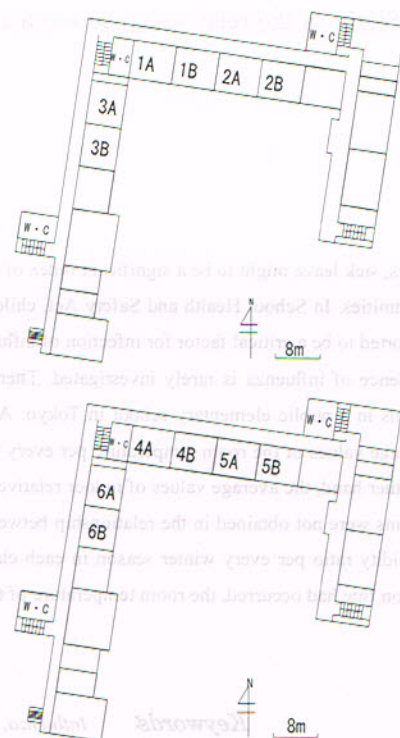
Plan of school S (upper:2<sup>nd</sup> floor, lower 3<sup>rd</sup> floor)
